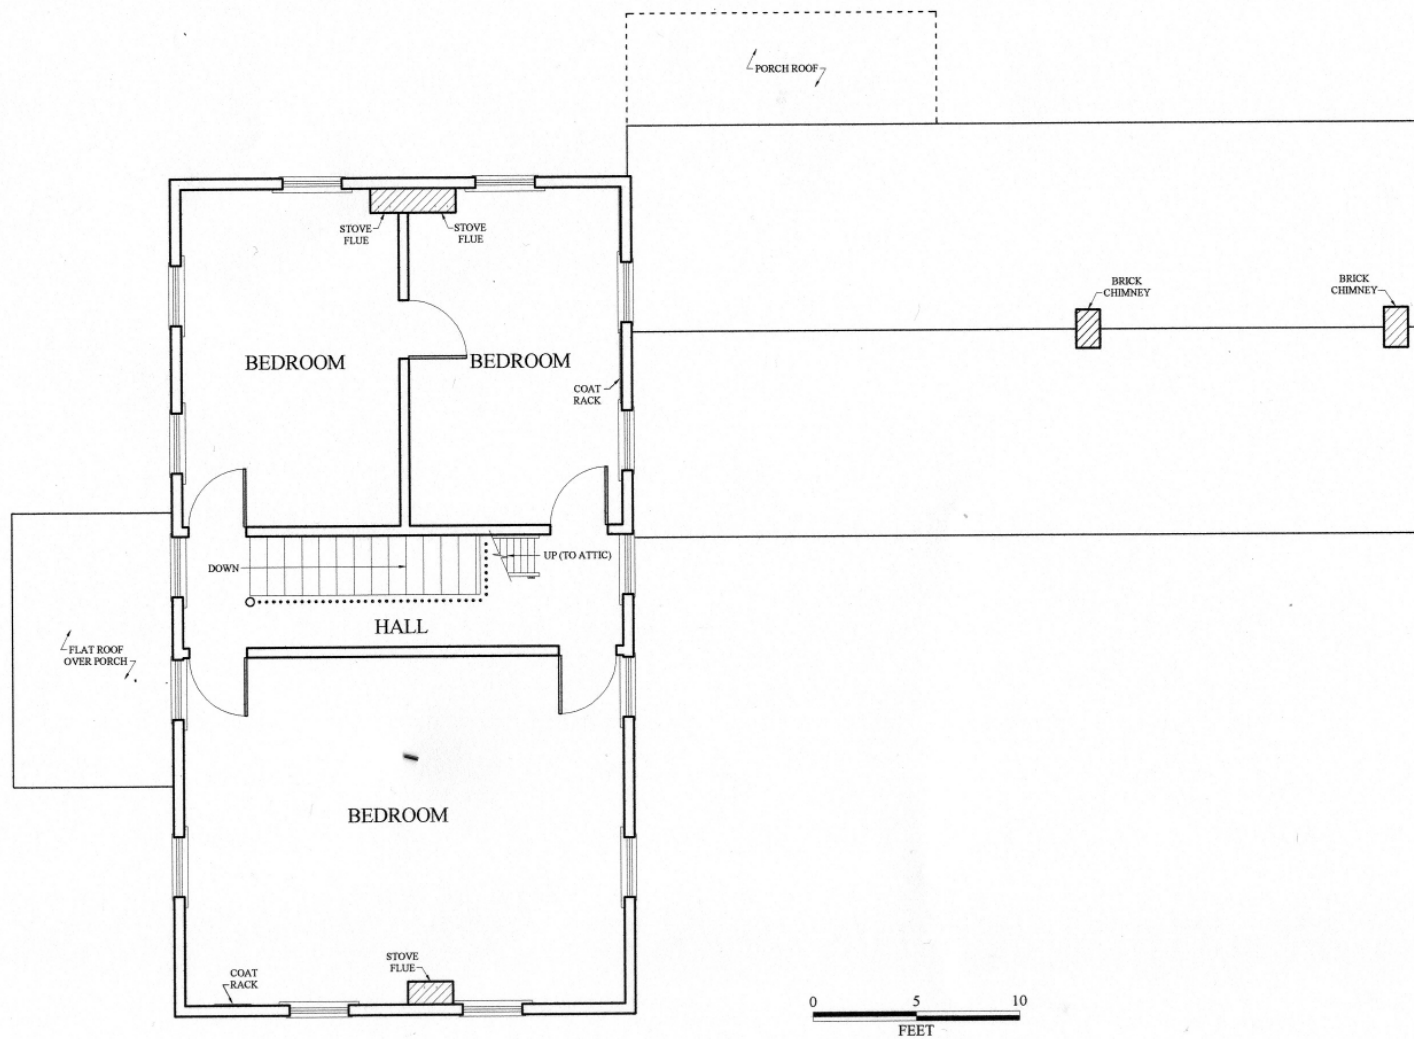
Second story floor plan of the Roman-Seibert House, circa 1900.
